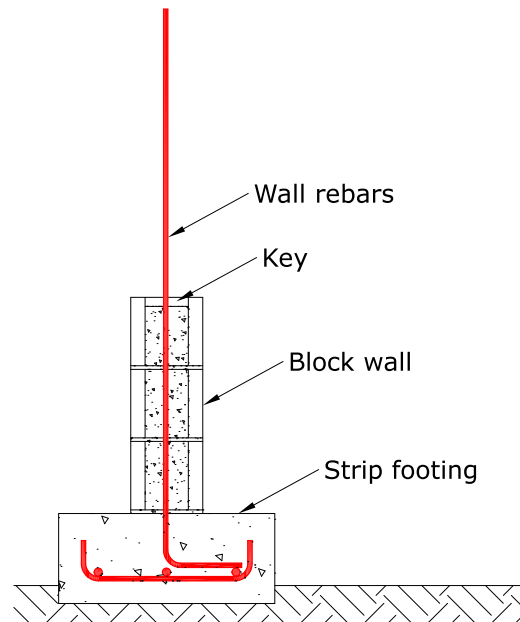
STRIP FOOTING REINFORCEMENT
